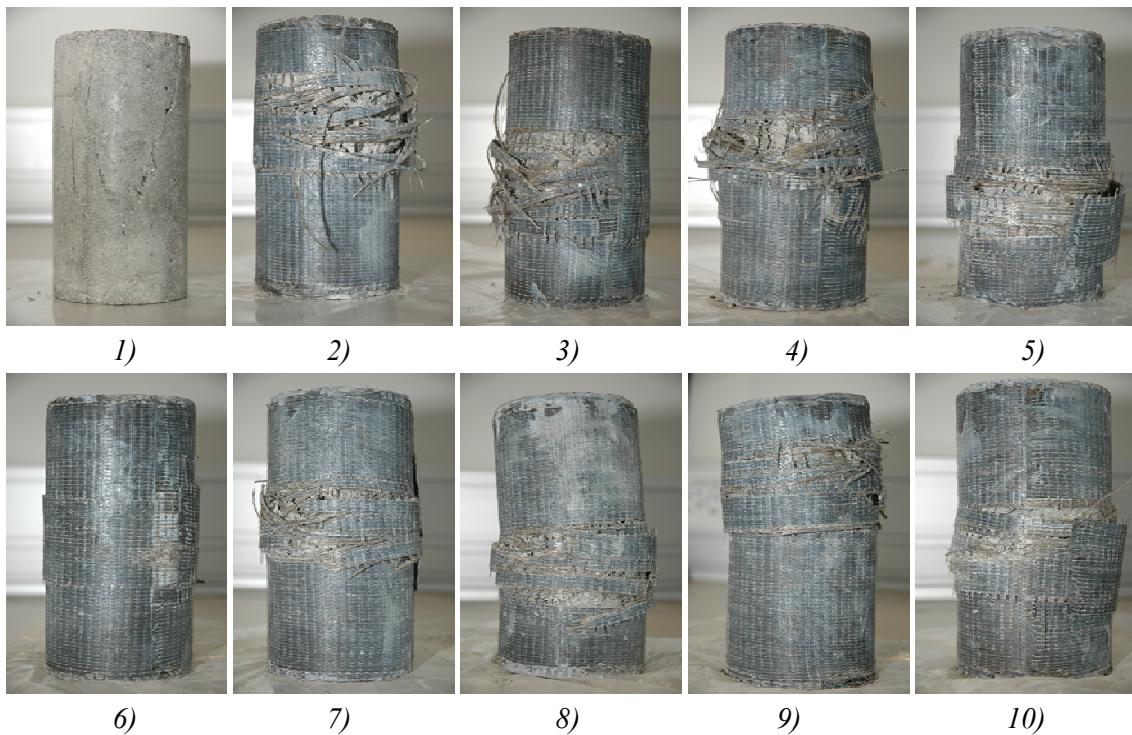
Failure modes of specimens SBU: 1) Concrete failure SBU0-3, 2) Explosive rupture SBU1-1, 3) Explosive rupture SBU1-2, 4) Explosive rupture SBU1-3, 5) Tensile rupture and delamination SBU2-1, 6) Tensile rupture and delamination SBU2-2, 7) Explosive rupture SBU2-3, 8) Explosive rupture SBU3-1, 9) Explosive rupture SBU3-2, 10) Tensile rupture and delamination SBU3-3.
